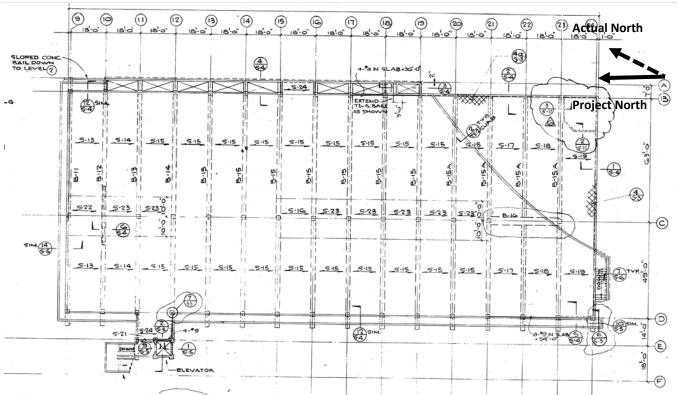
Overview of Village level, (South Pier Parking Structure) (BA1-167)
